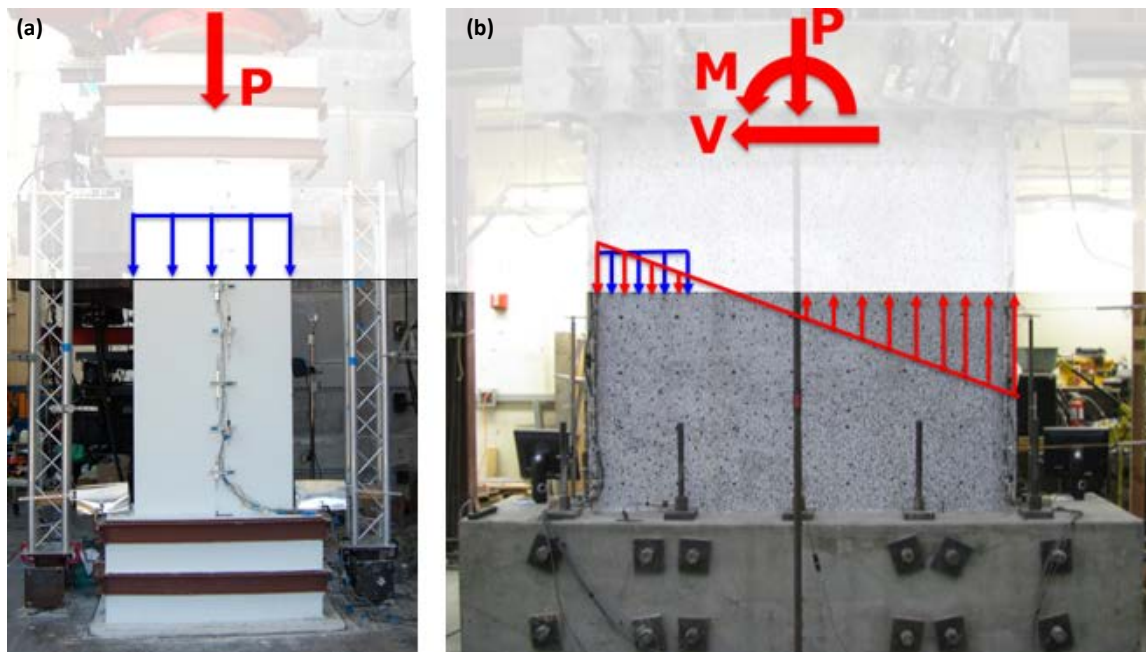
Loading conditions on (a) isolated boundary element; and (b) wall panel
